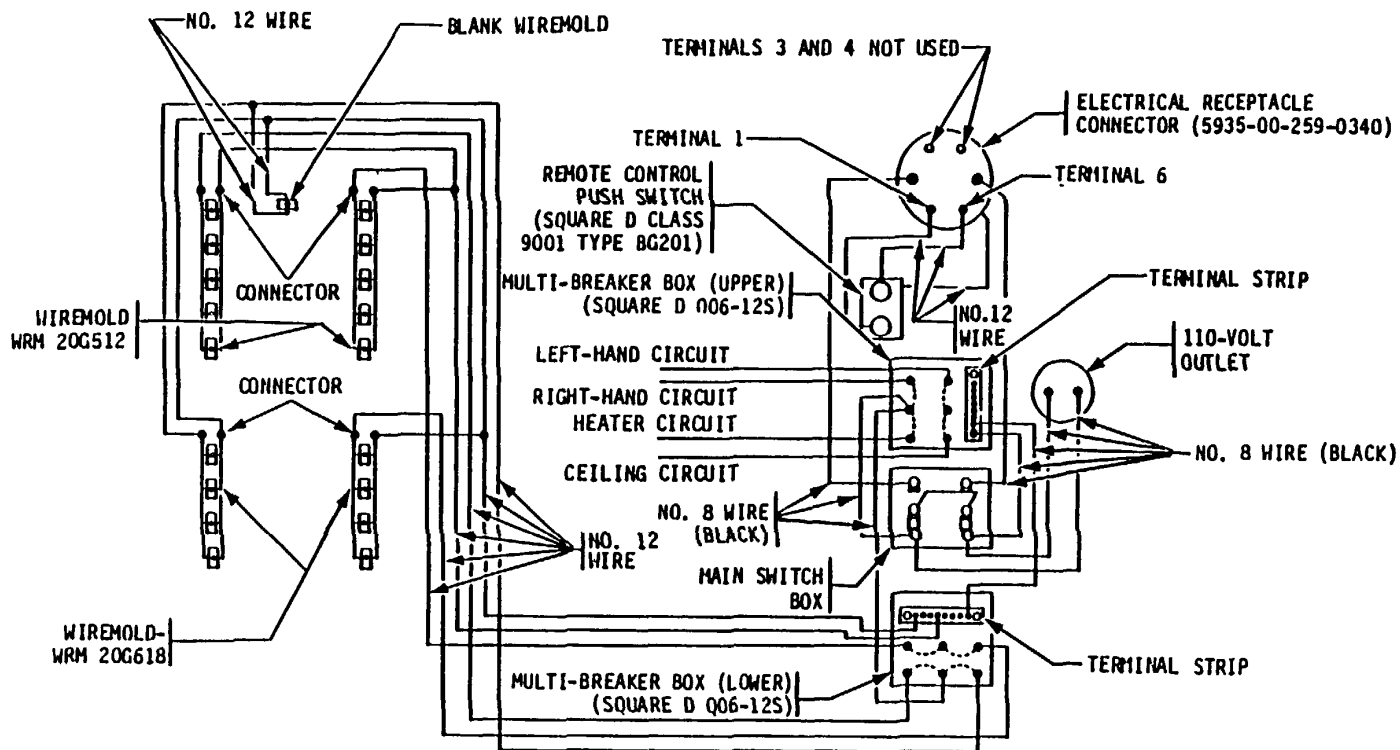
Main Switchbox Modification, Back Wall of Main Switchbox.
